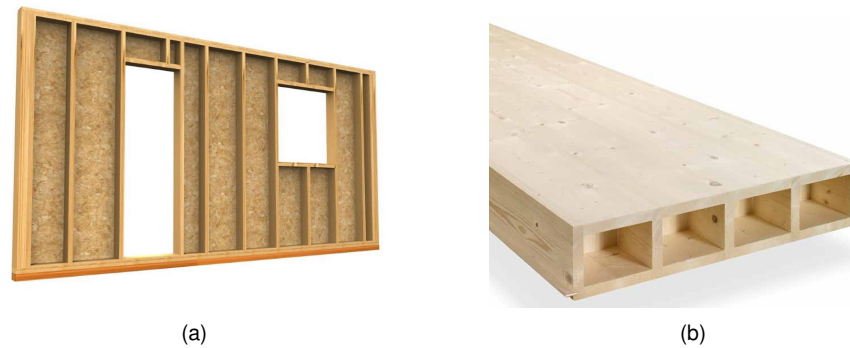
Timber framed wall and modular box element (ref. lignature).
